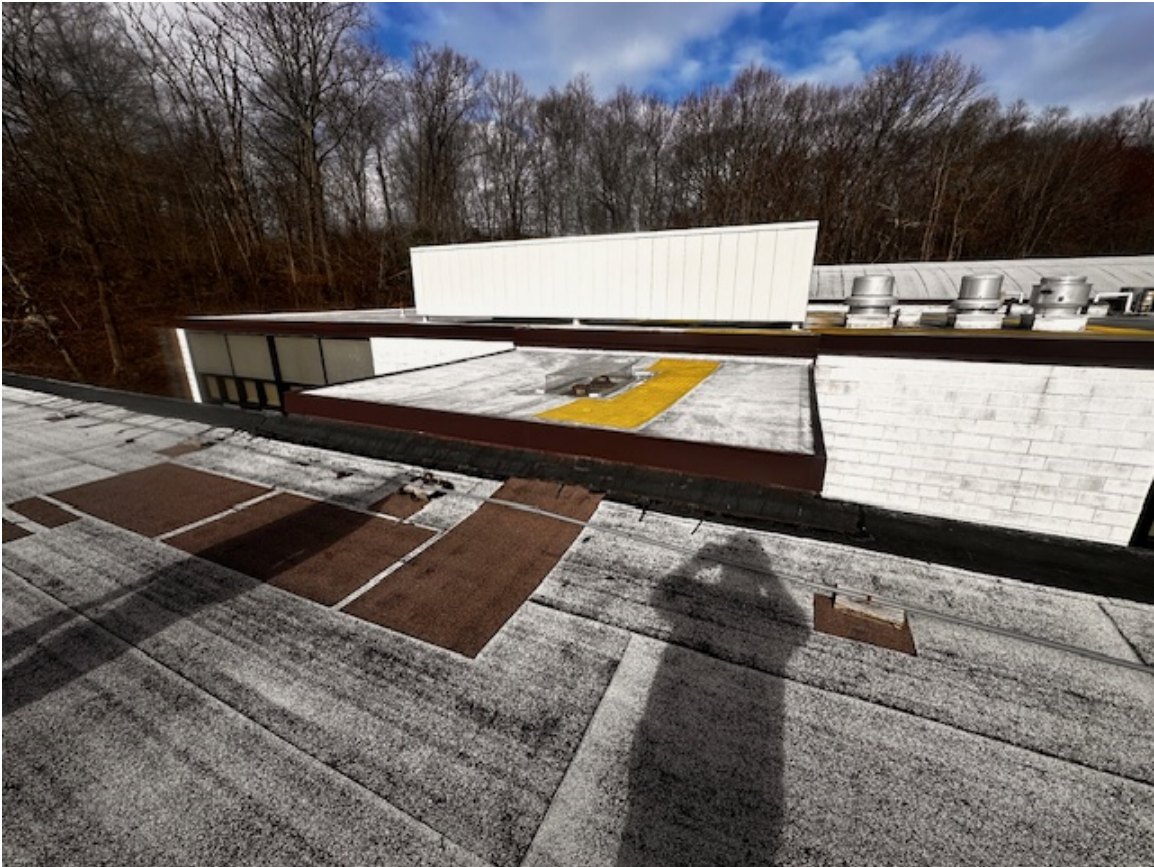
Perspective of standing on the roof looking down on the cracked CMU walls of the sallyport, where it abuts the existing building. Photo is taken from the existing building with the library in the background.
